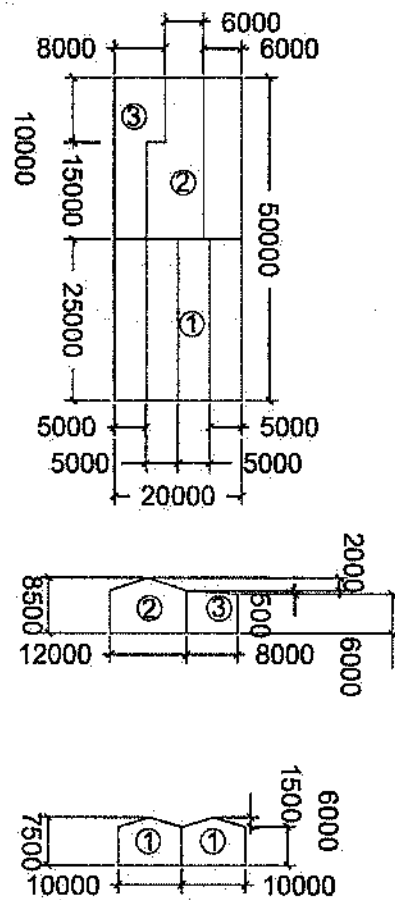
Plan and typical elevation for polishing shop (BLDG 664)
